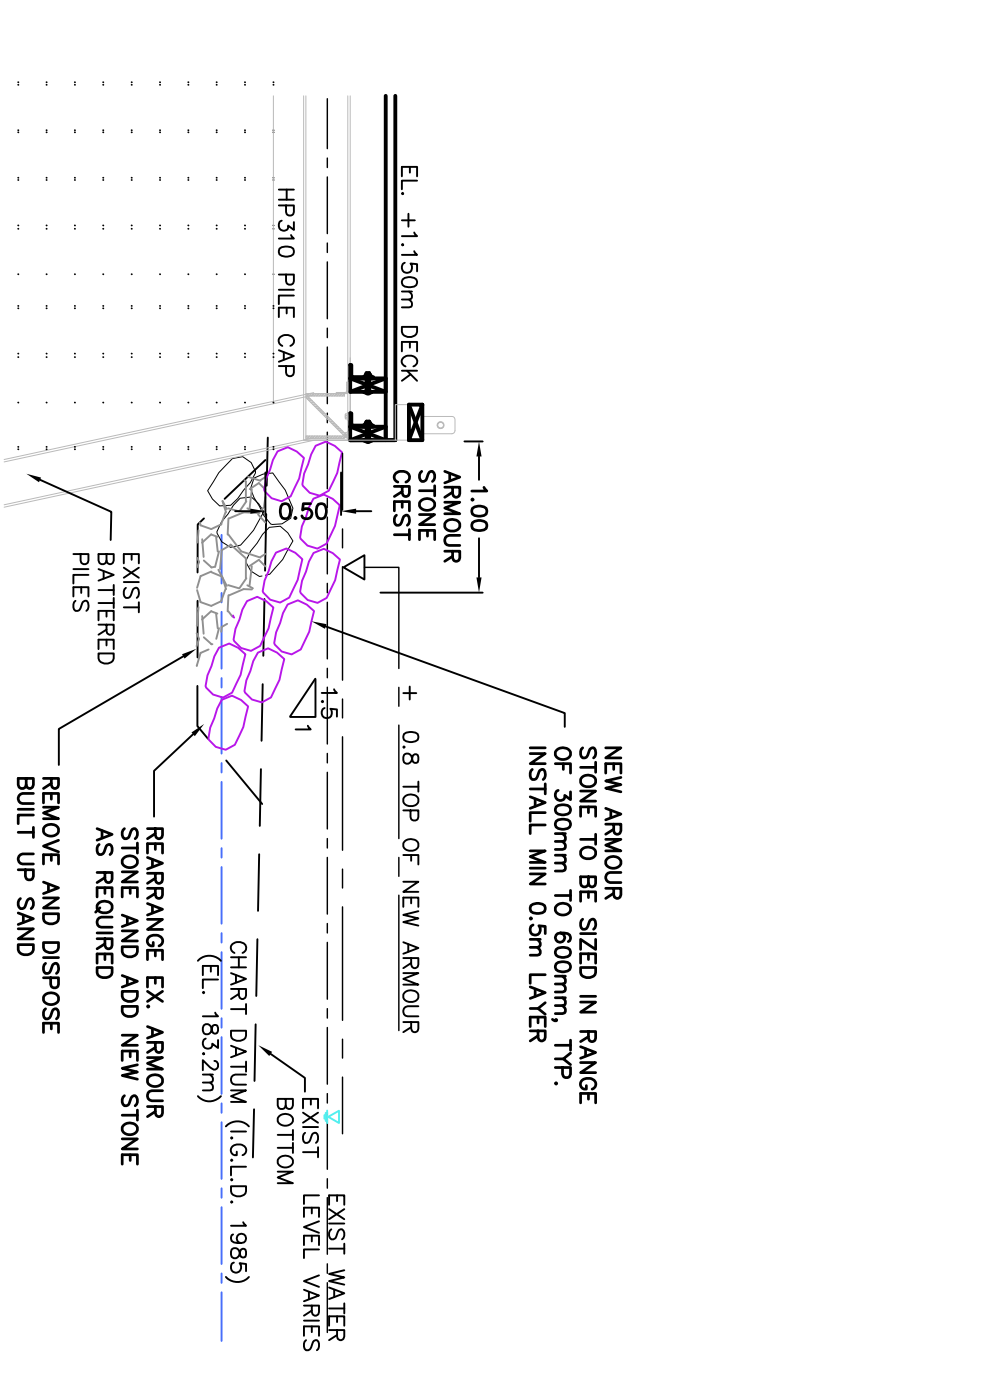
DETAIL AT EXIST PILE CAP AND NEW CONC SLAB
